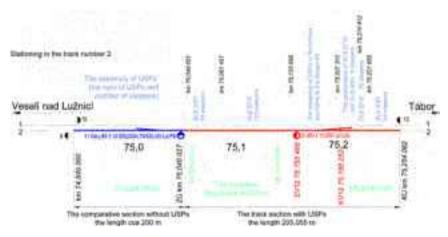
The scheme of the trial track section in the Planá nad Lužnicí railway station
